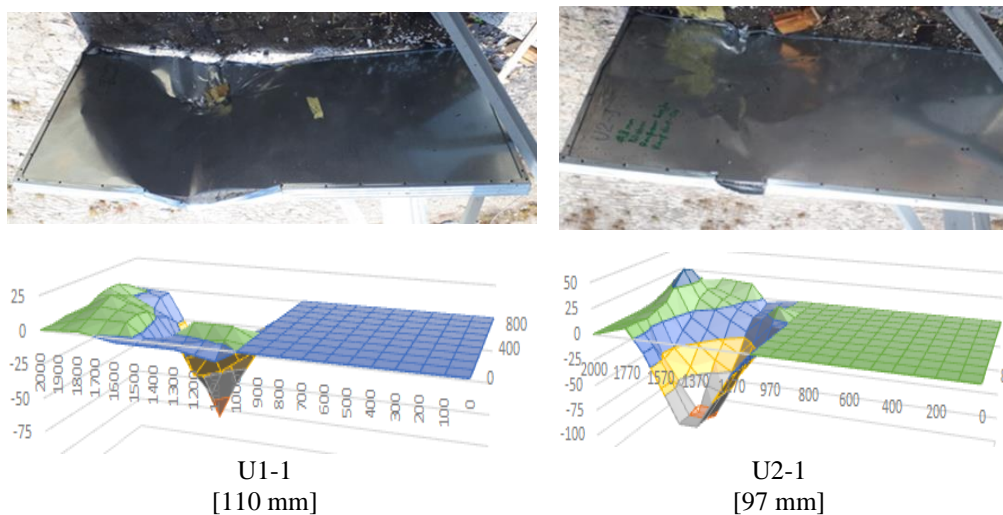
Deformation of door leaves for specimens U1-1 and U2-1
